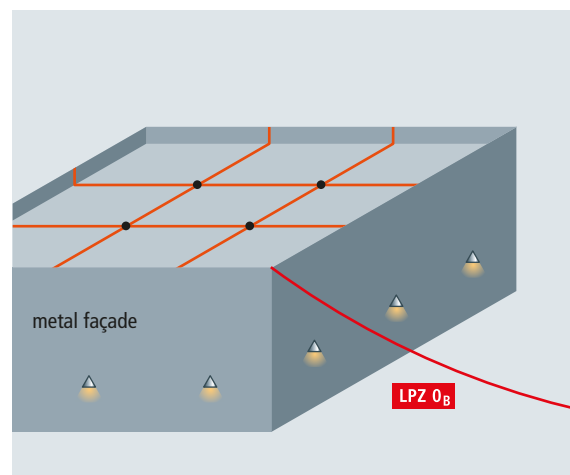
LED outdoor lights on the metal façade of a building with external lightning protection which fulfils the requirements for non-observance of the separation distance
